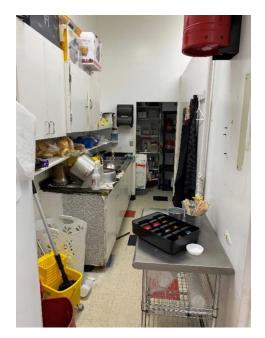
Cracked P.Lam Counters & Old Cabinets
